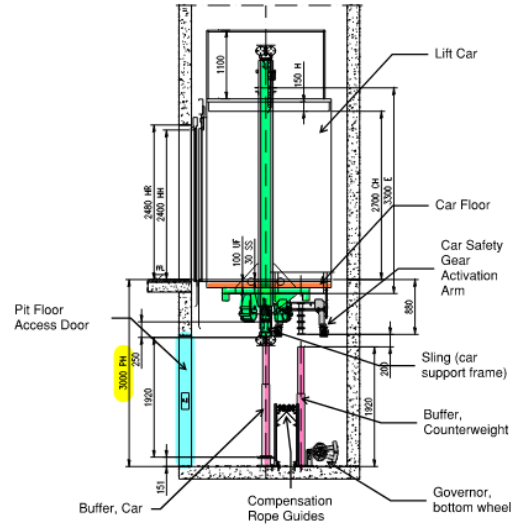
Example of pit access for lifts with pit depths > 3.0 m
